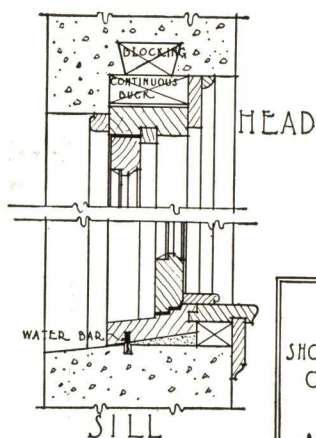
DETAIL "B" AN AUSTRAL FRAME ADAPTED TO STONE WITH HARD WOOD INTERIOR FINISH.
